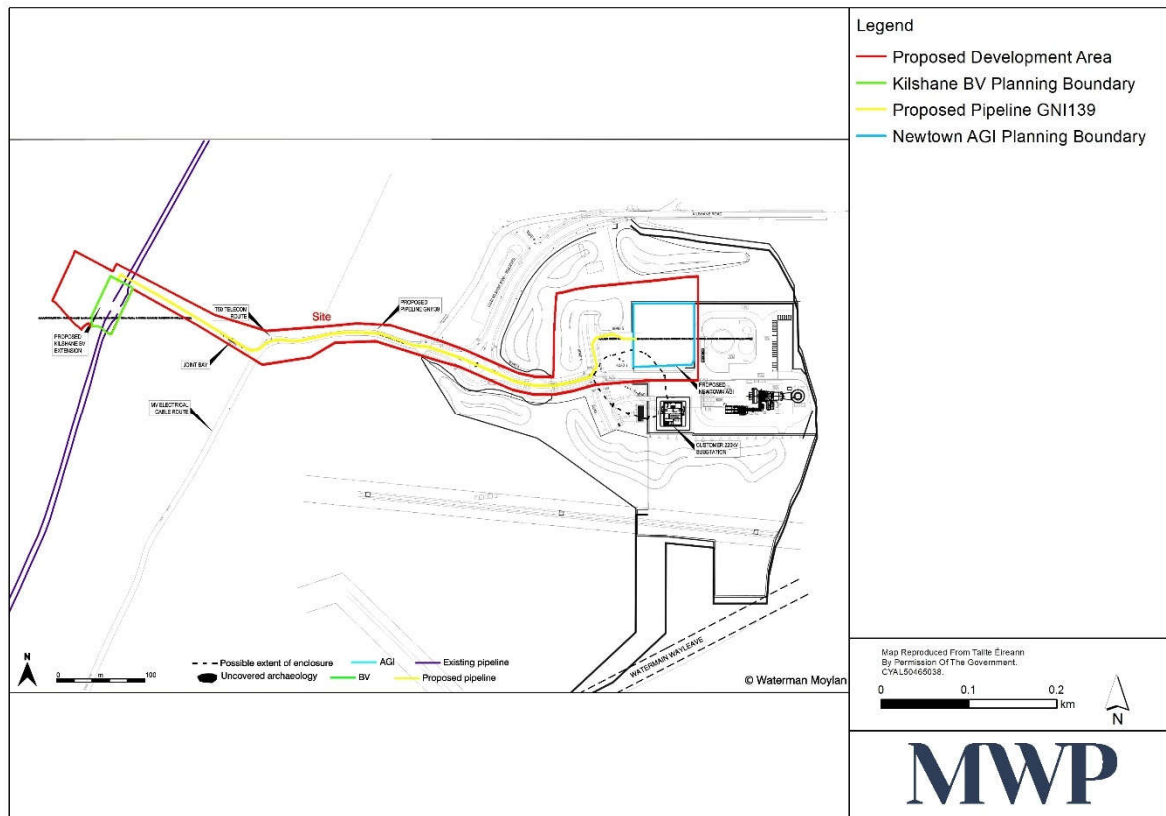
Details of Proposed Development Site and Permitted Kilshane Energy Facility
